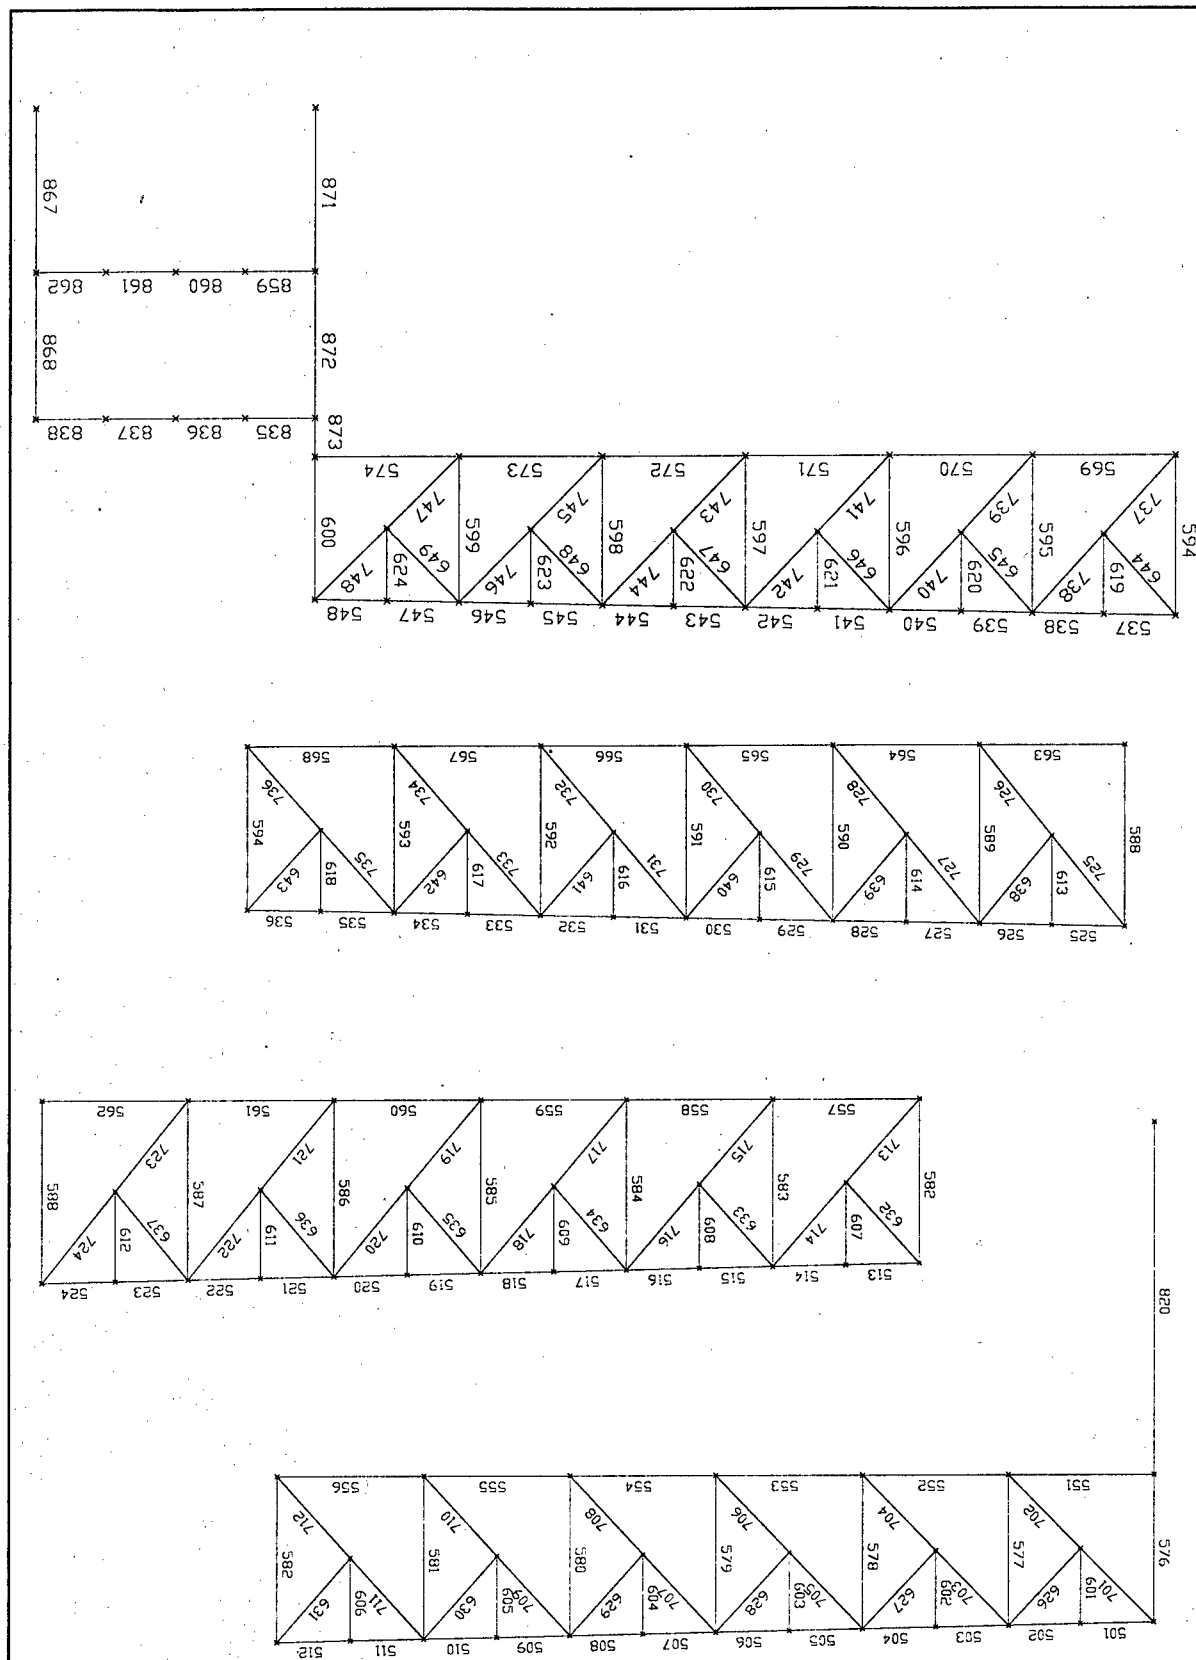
CCAD, TX, element numbers for Truss T1, Hangars 44 and 45.
